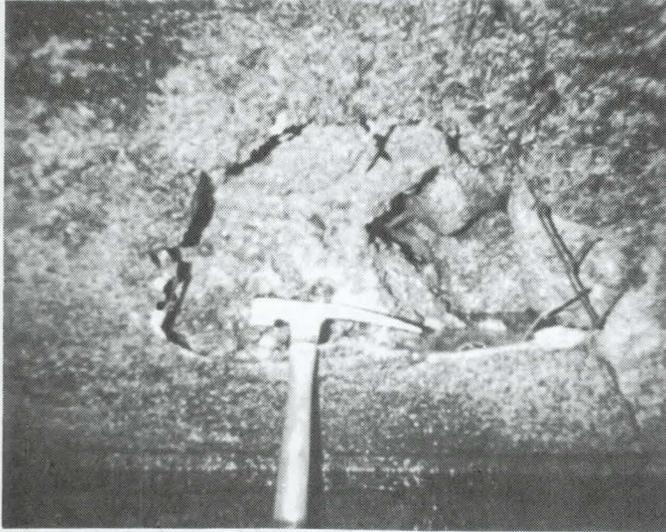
OUTLET — INTERNAL EROSION
